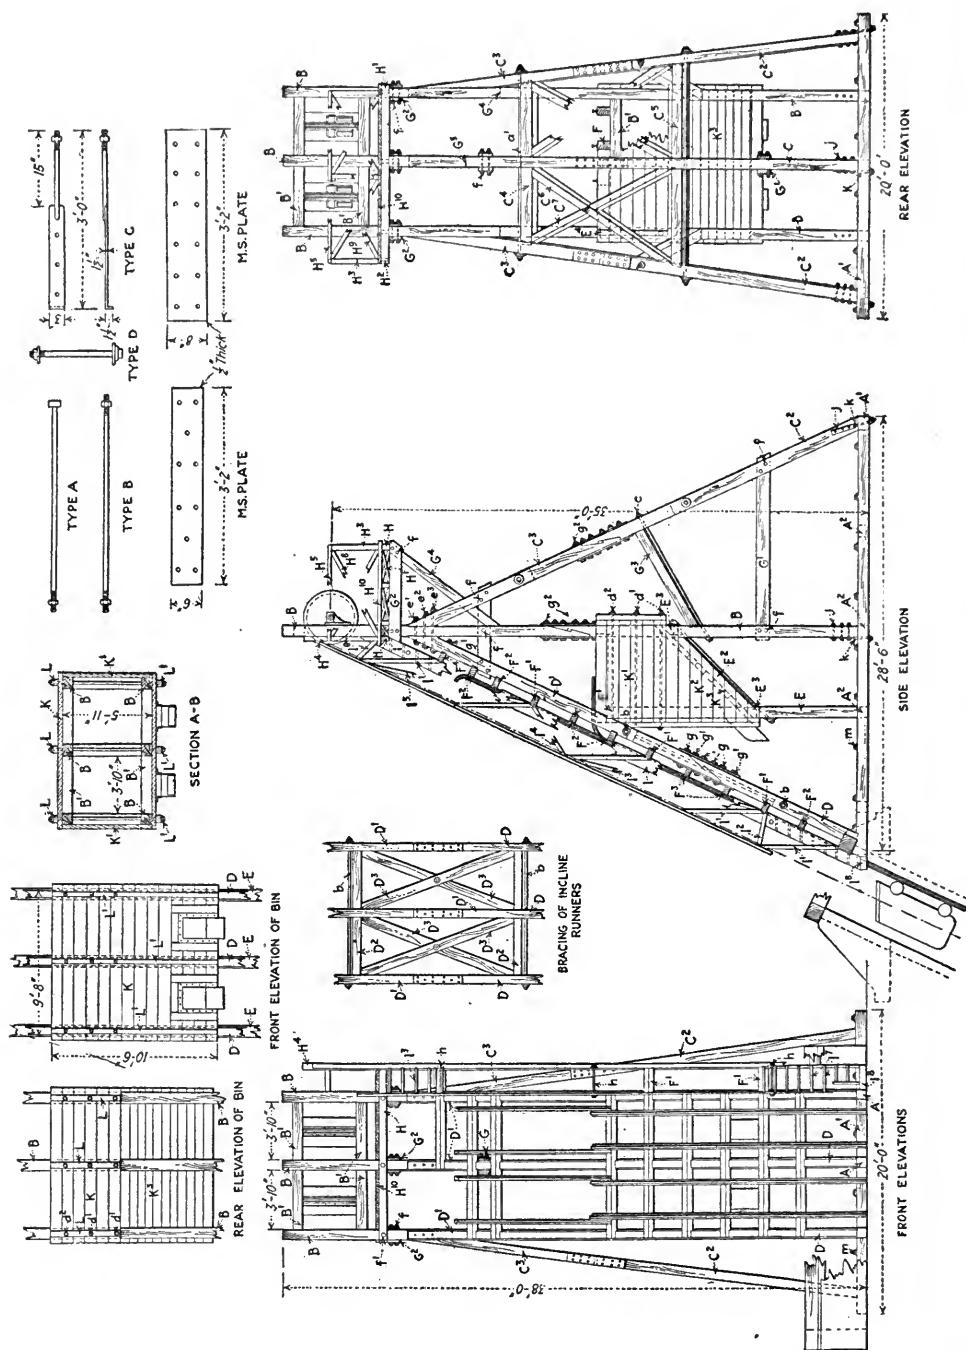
ELEVATIONS AND DETAILS OF SMALL TIMBER HEADFRAME FOR INCLINED SHAFT.
